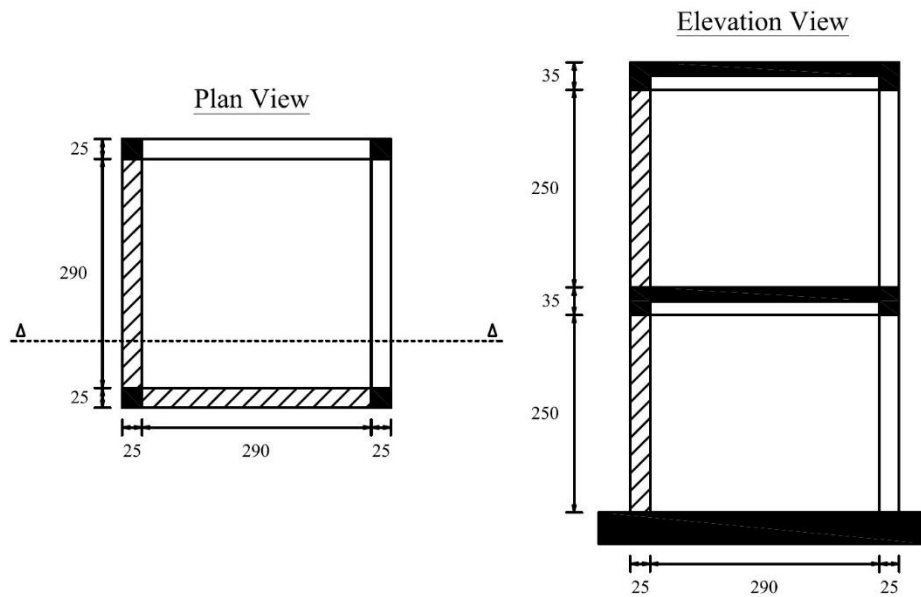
Plan (left) and elevation (right) views: hatched parts represent the infill walls (units in cm) [adapted from Fardis et al. (1999)].
